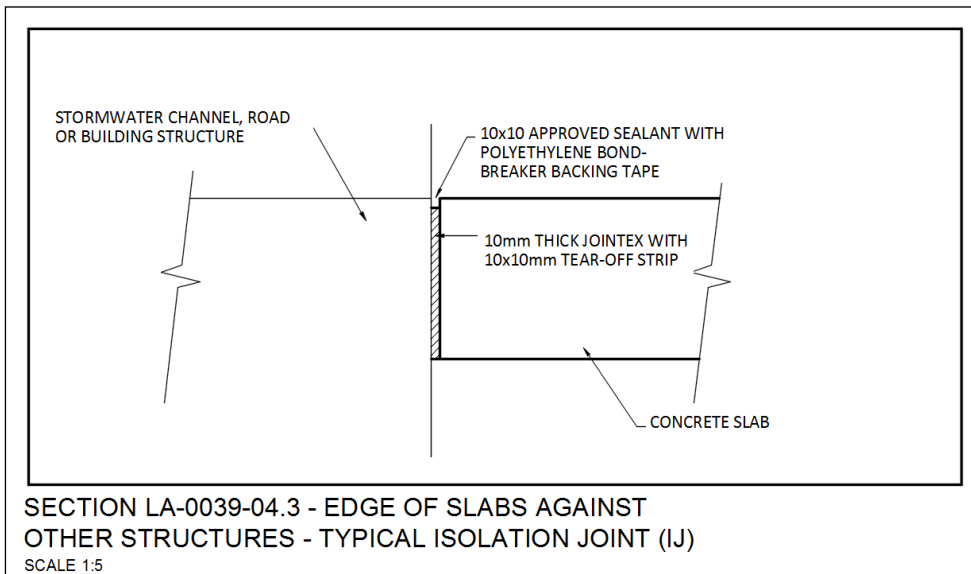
Edge of Slabs Against Other Structures - Typical Isolation Joint
